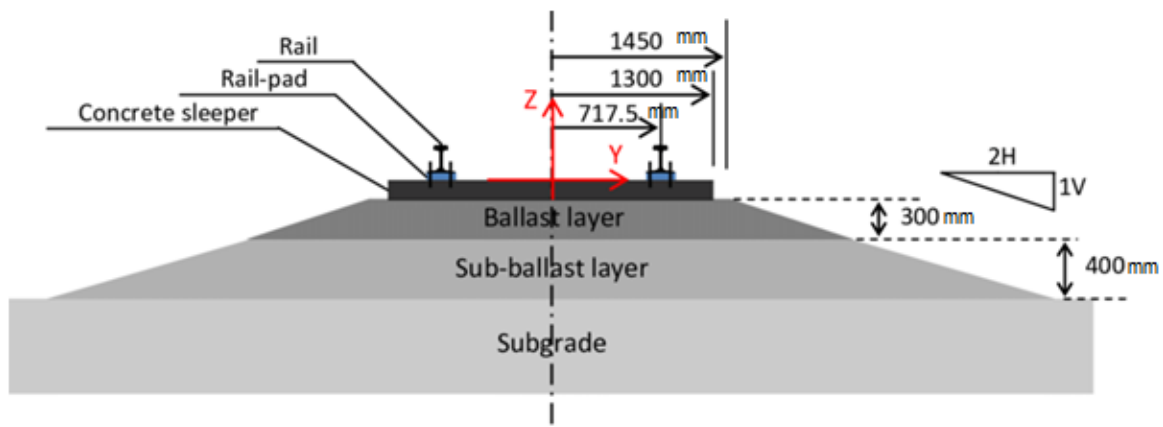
Typical cross-section of a railway track (Mezeh, 2017).
